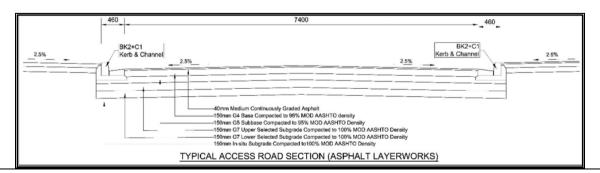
Proposed Road Layerworks: Asphalt- 640mm total thickness (source: Walters, 2020)
